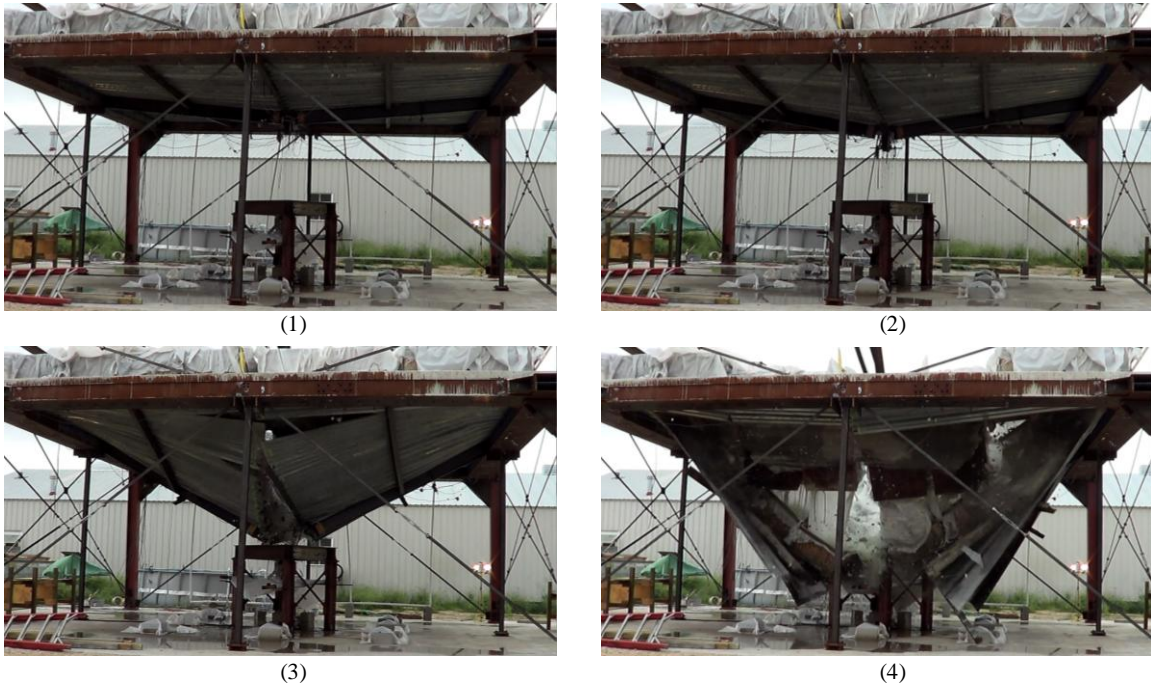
ICL specimen: snapshots from video footage during collapse, east view
